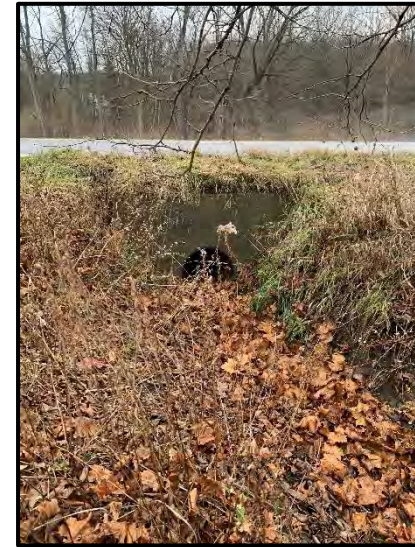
11/20/2020 – STREAM-3SP location, facing south.
